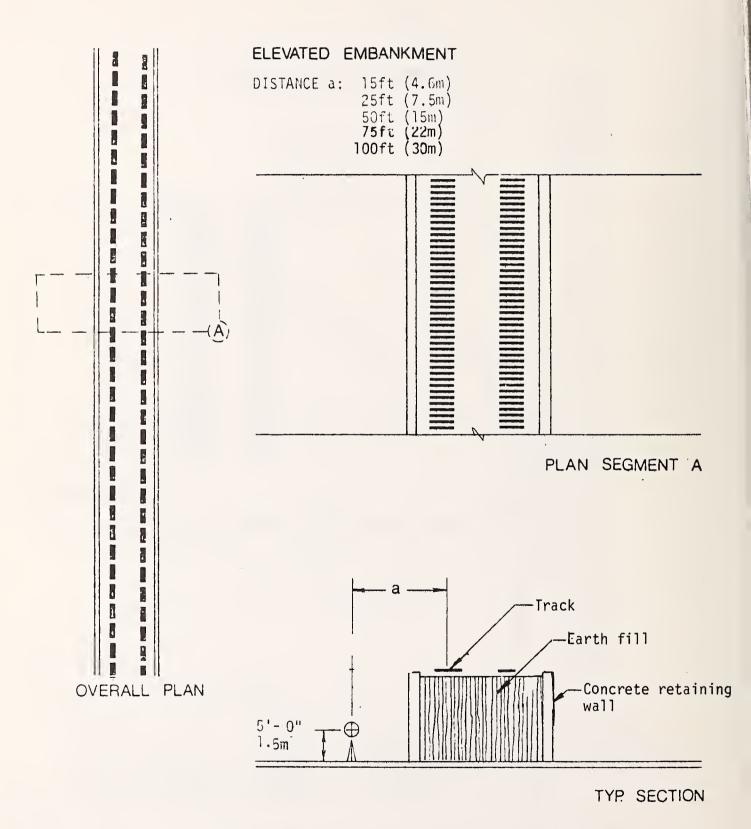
Wayside Measurement Location Adjacent to Elevated Embankment Structures
